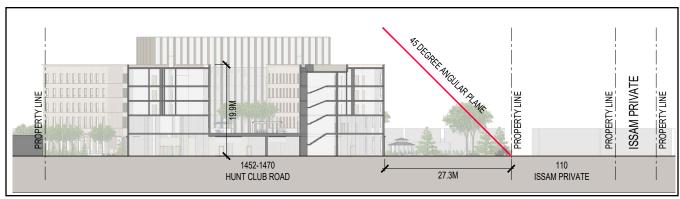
East-west cross section at the closest point between Project and property line, looking north
